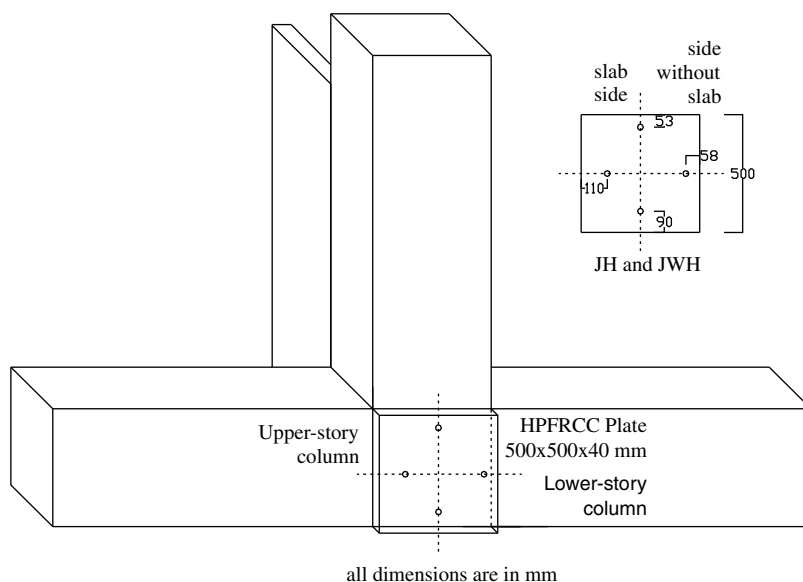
Details of HPFRCC retrofitting (specimen JWH)
